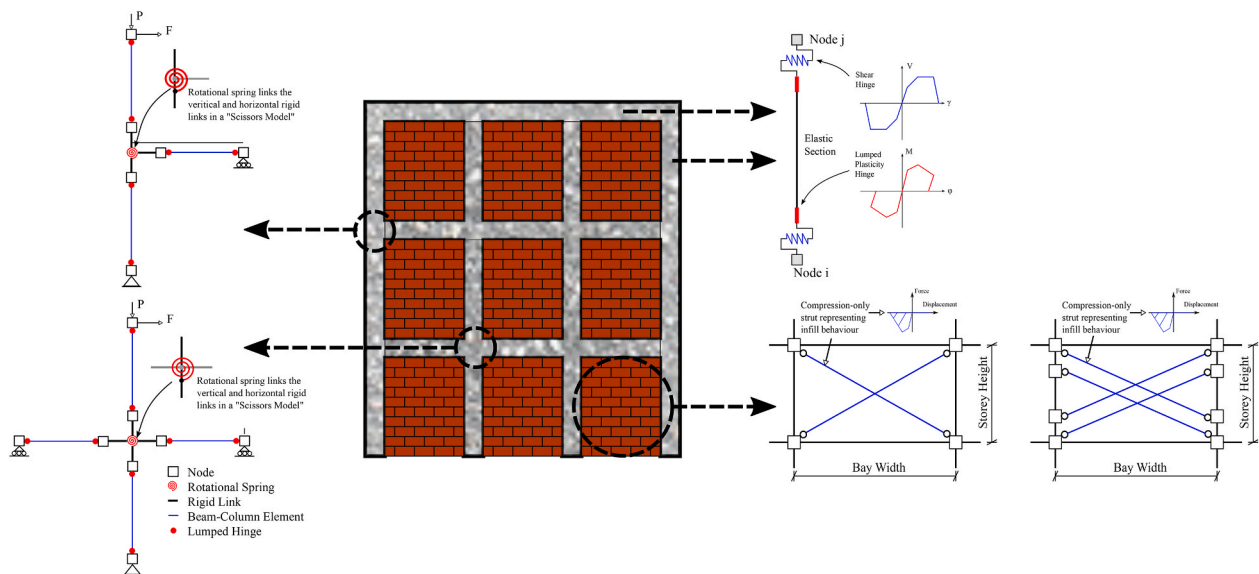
Illustration of the numerical modelling approach used for the modelling of beam-column elements, interior and exterior beam-column joints and masonry infill panels for the archetype database of infilled RC building structures in OpenSees.
